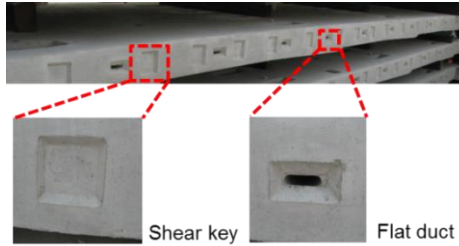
Examples of shear keys and flat ducts on sides of precast concrete bridge deck panels
